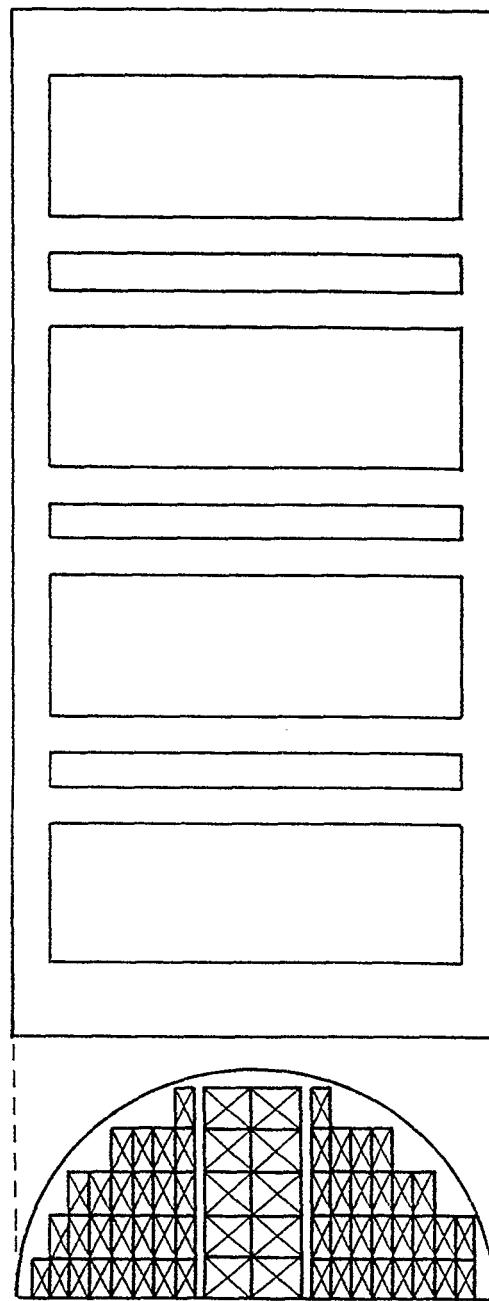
End Elevation and Plan Views of a Typical Magazine Showing a Proposed Stacking Arrangement.
